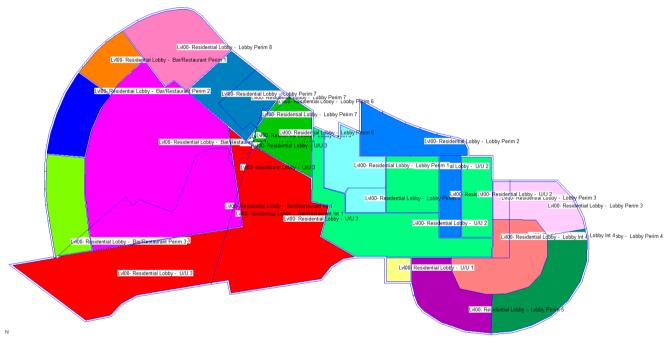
Ground Floor Residential Lobby HVAC Zoning
